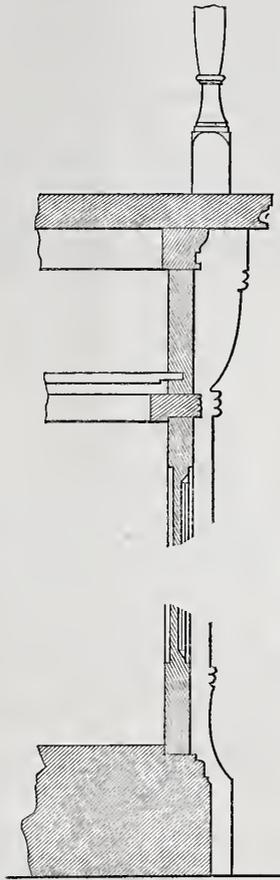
Vertical Section through Sideboard, Fig. 6.—Scale, 1 1/2 Inches to the Foot.
